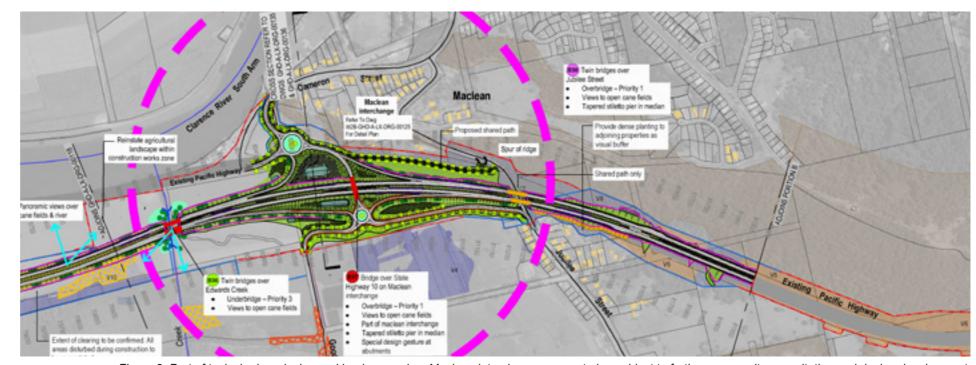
Part of typical urban design and landscape plan, Maclean interchange concept plan subject to further community consultation and design development.
